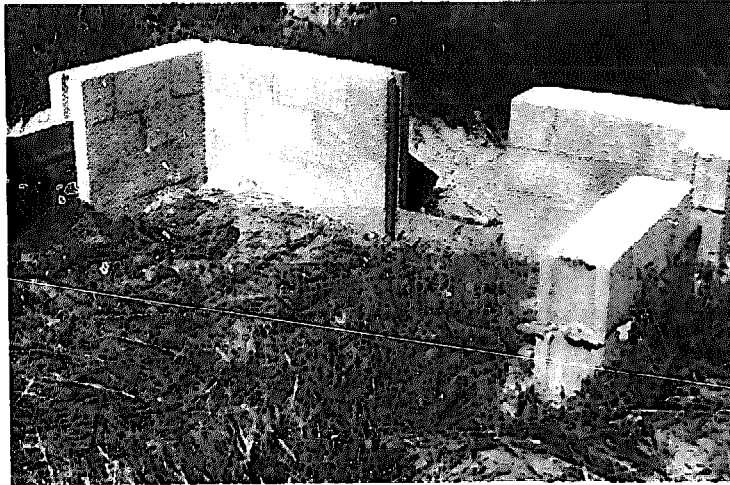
Control gate made of precast concrete blocks, in unlined canal.
